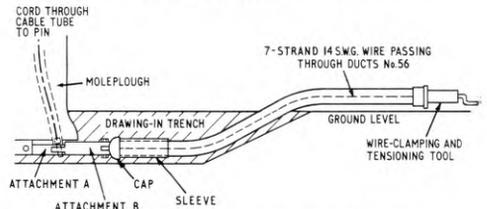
EQUIPMENT READY TO DRAW IN DUCT
